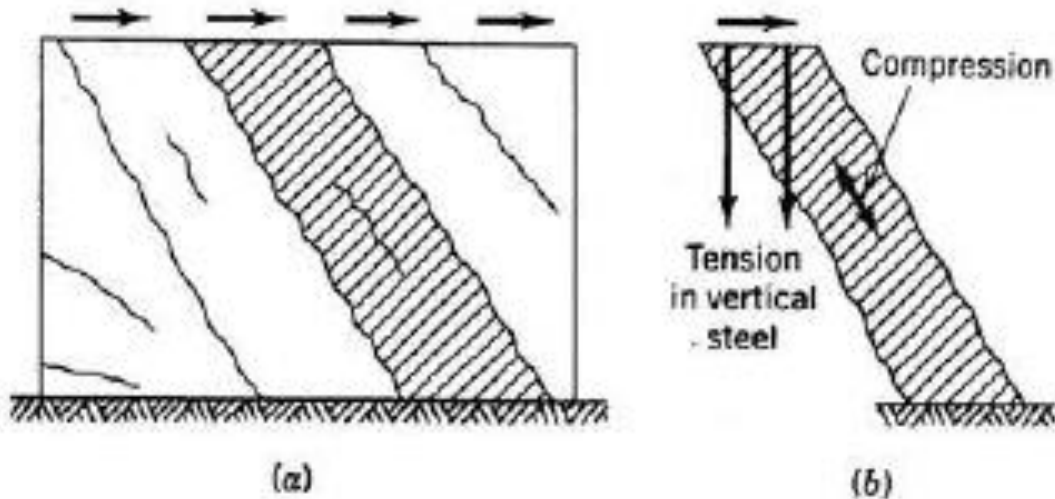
Failure mode: low-rise wall. (a) Shear crack pattern. (b) Compression strut between cracks.
